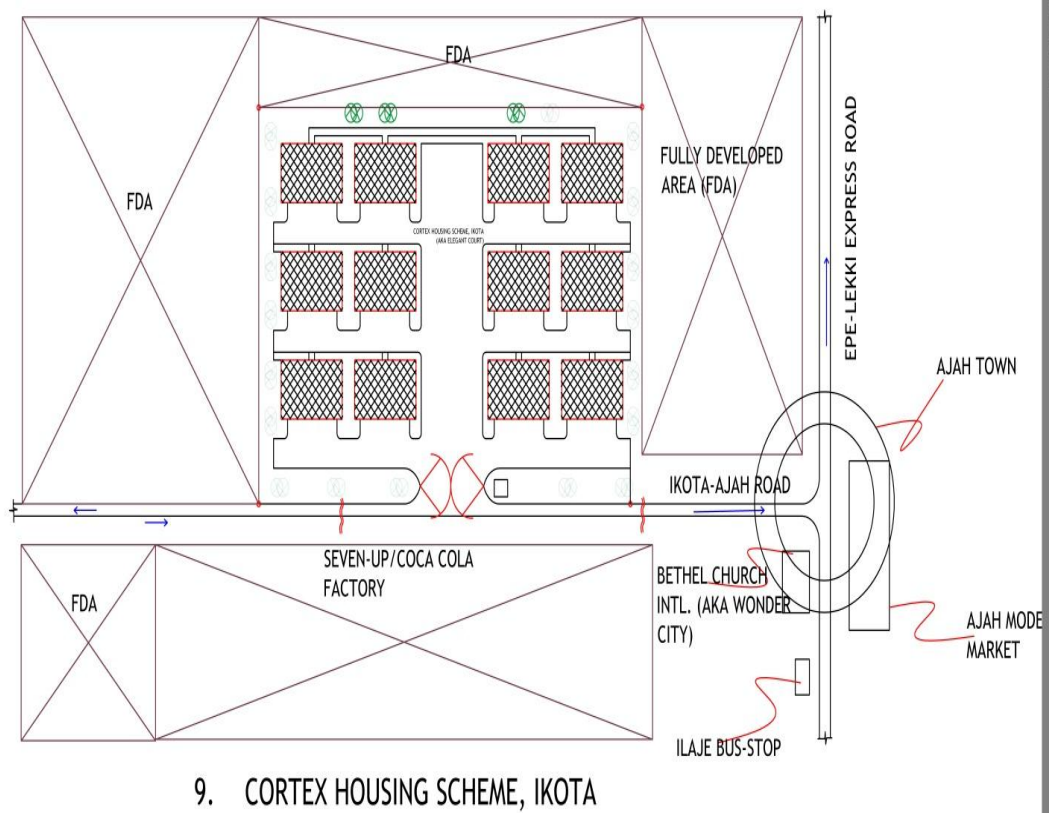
Location/Layout Plan, Cortex Housing Scheme, Ikota
